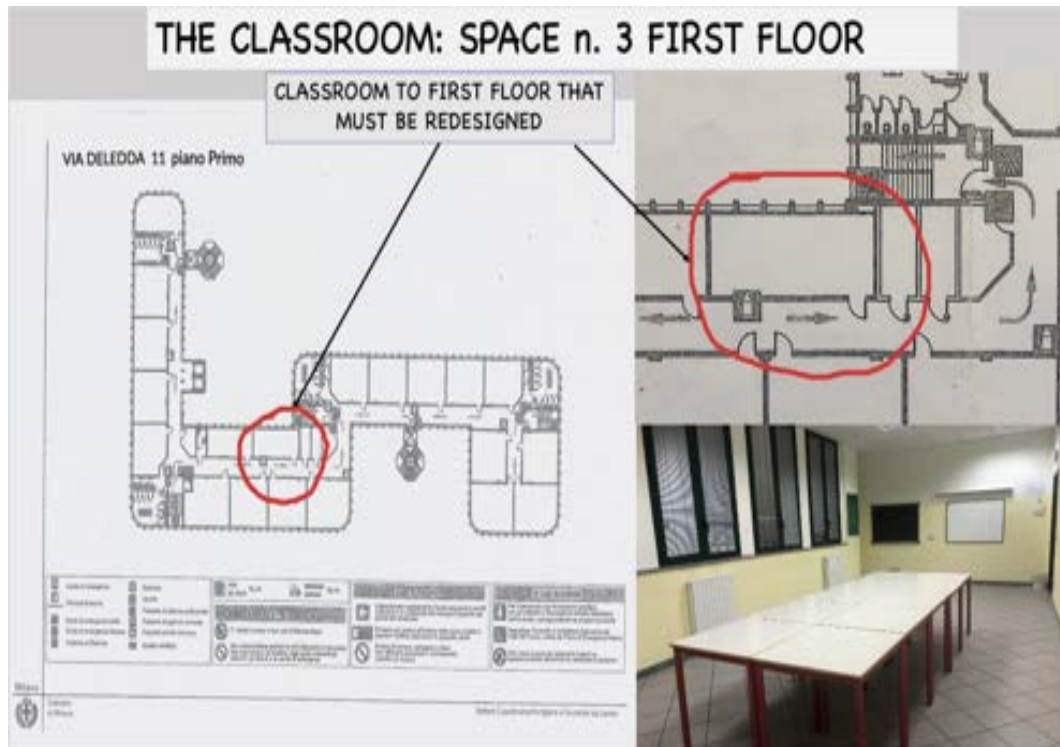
SPACE N. 3: THE CLASSROOM AT THE FIRST FLOOR
